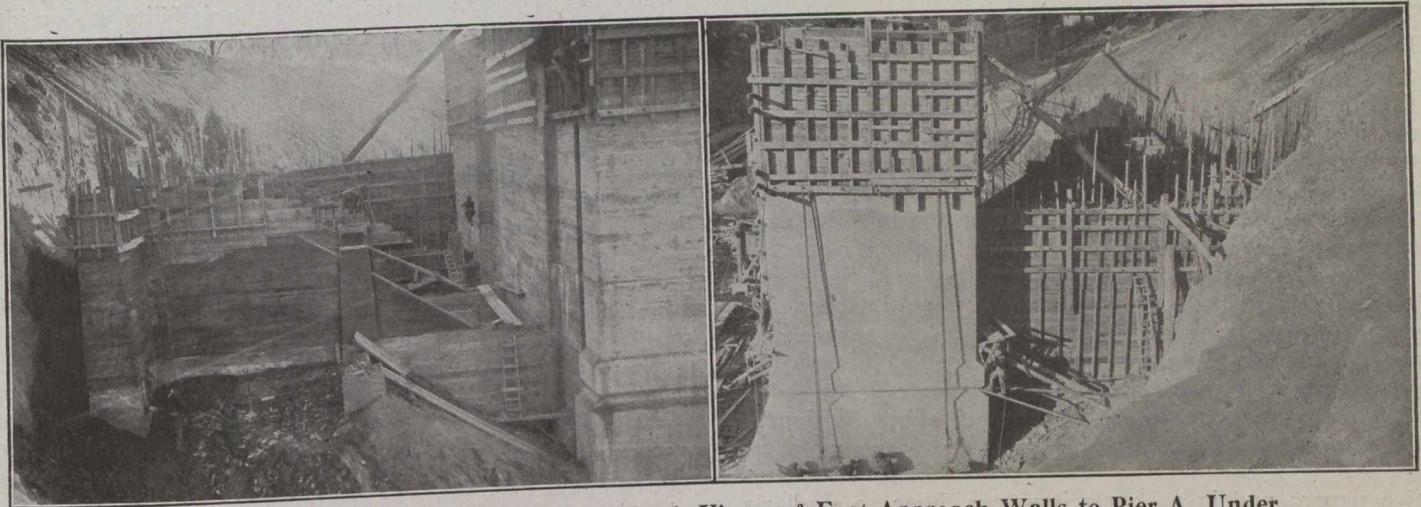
The Don Section—South and North Views of East Approach Walls to Pier A, Under Construction, November, 1915.
